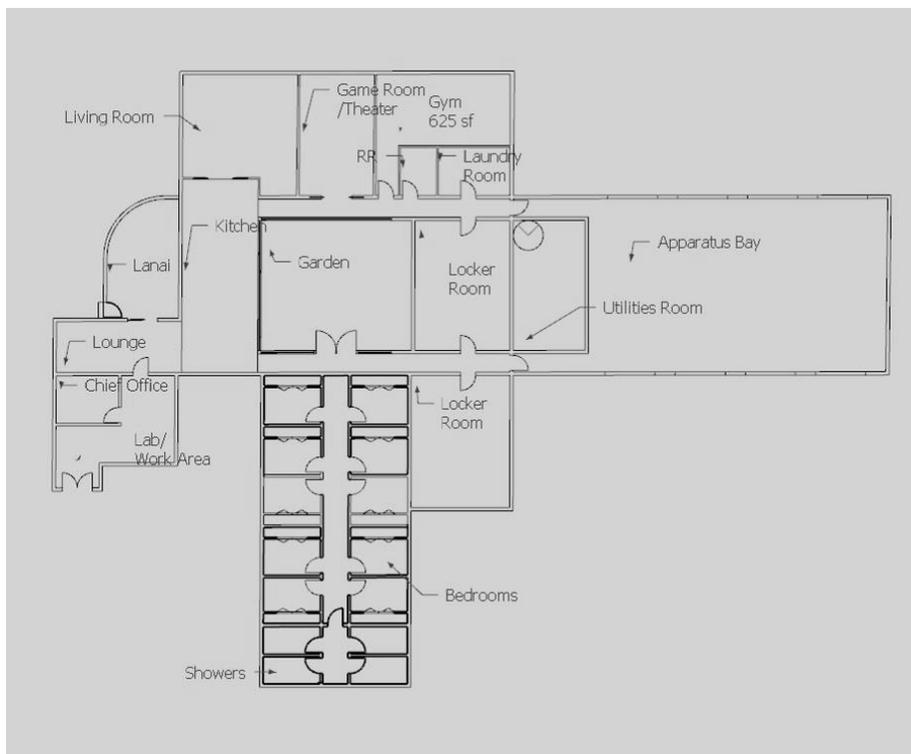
Student design and computer drawing of a floorplan for a fire house, permission from student participant Robert.
